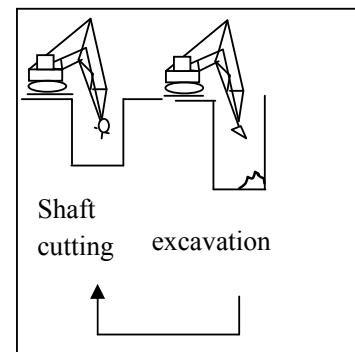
Shaft sinking from the surface by excavation with a crane or boom.
